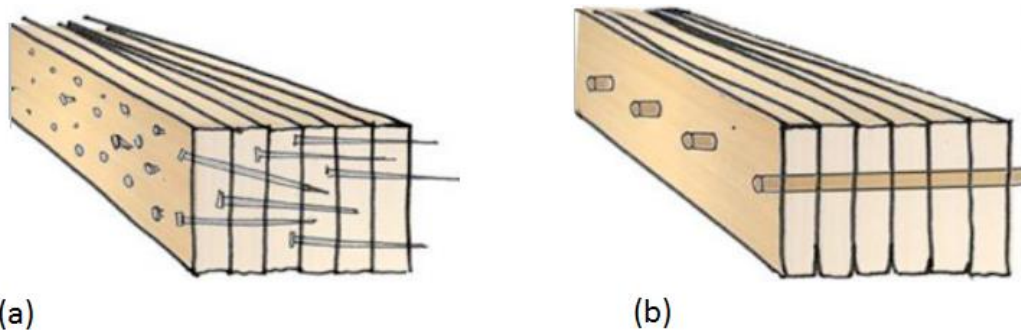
Concept of adhesive free laminated timber beams (“Brettstapel”):
